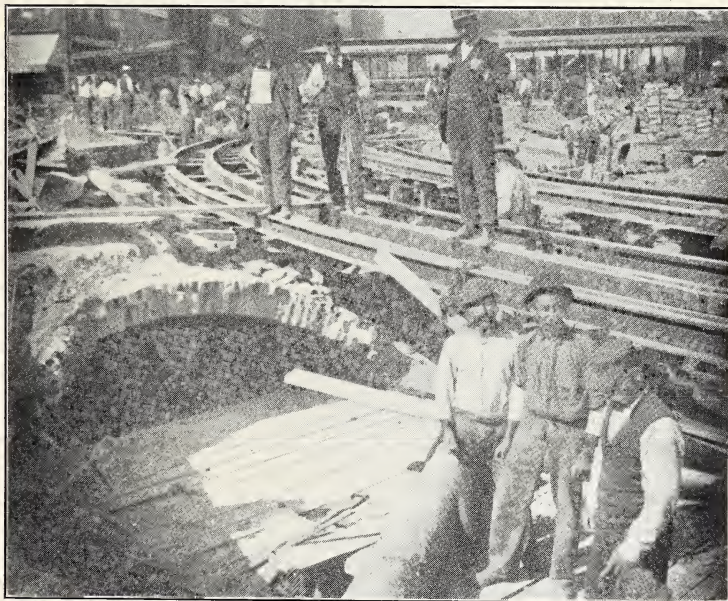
OBSTRUCTIONS. TRUNK SEWER, CANAL STREET.
